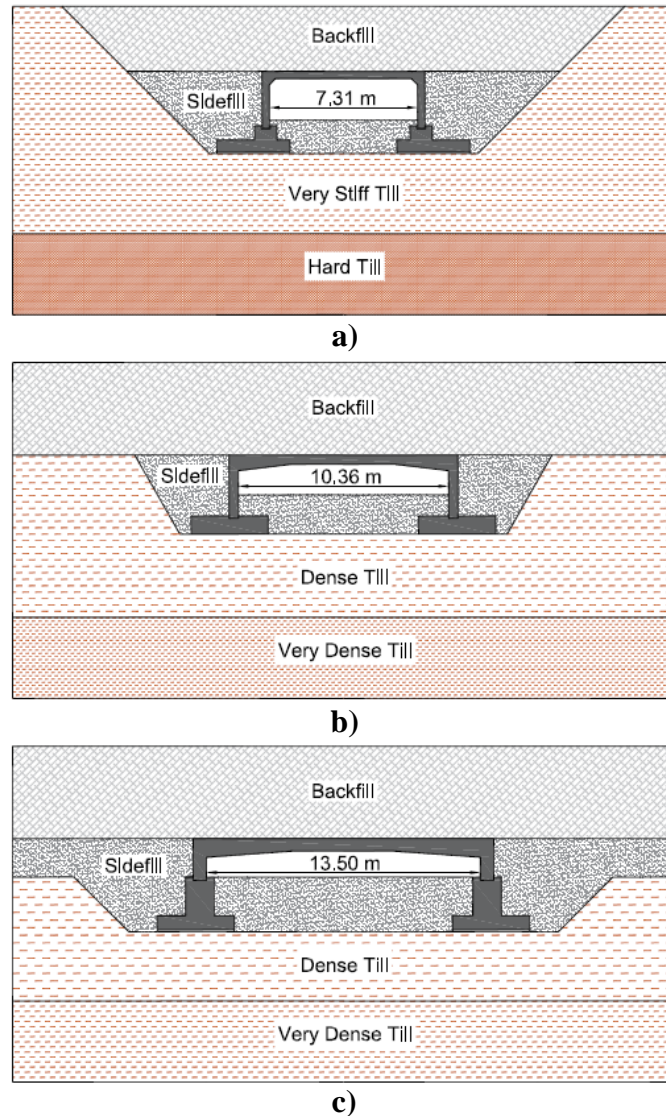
Installation method of the instrumented culverts: a) Remembrance culvert; b) Pickering culvert; and c) Oshawa culvert.
